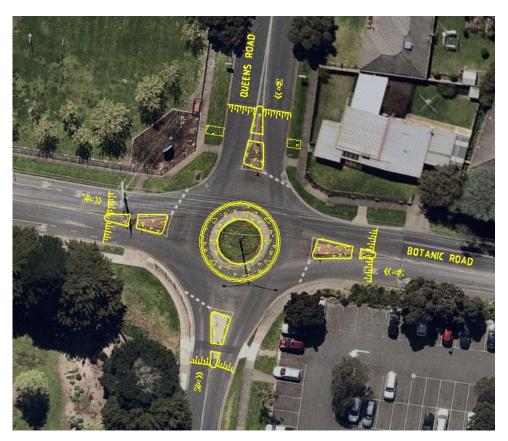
Botanic Road / Queens Road roundabout upgrade concept (note enlarged central island and splitter islands, raised pavement and sharrows)
